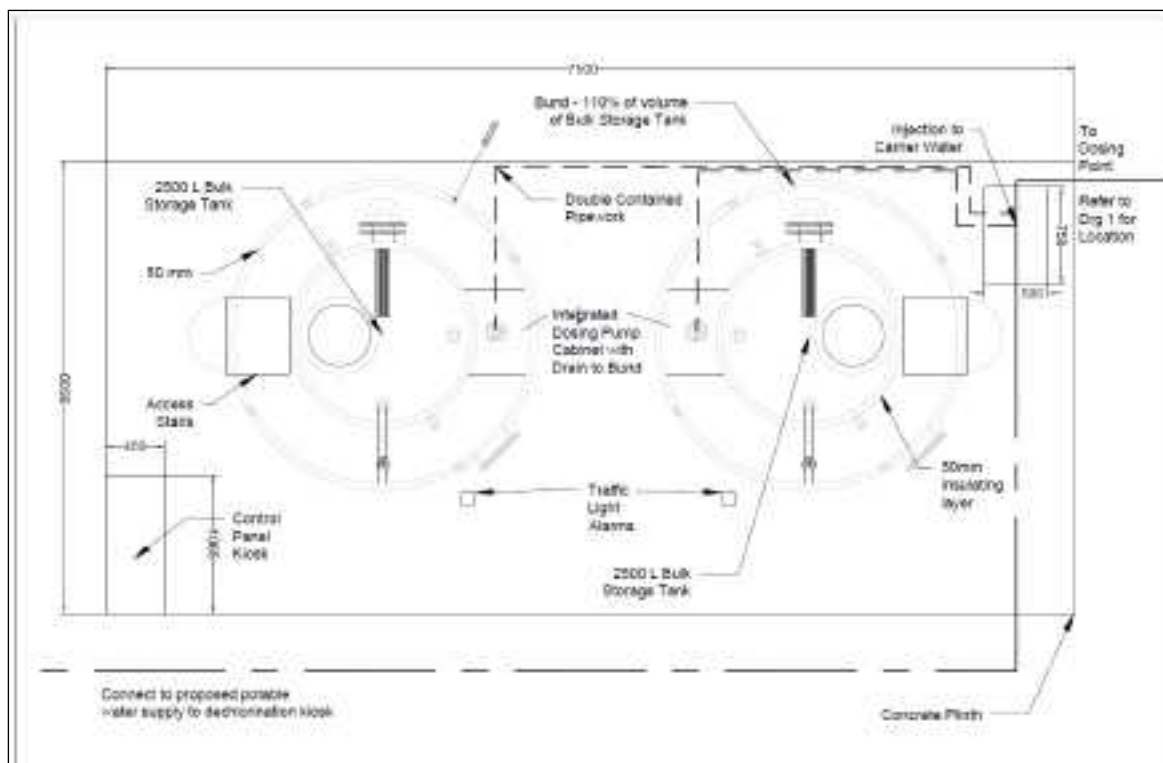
Plan and Elevation Drawings of a typical Orthophosphate Dosing Unit
